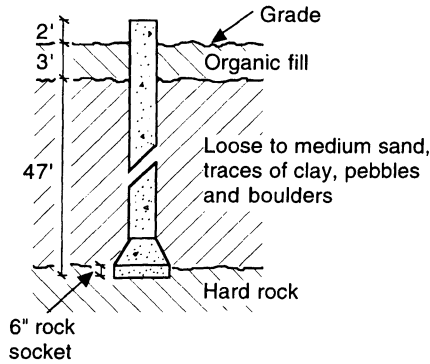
Example 8-8—Concrete caisson bearing on rock.
